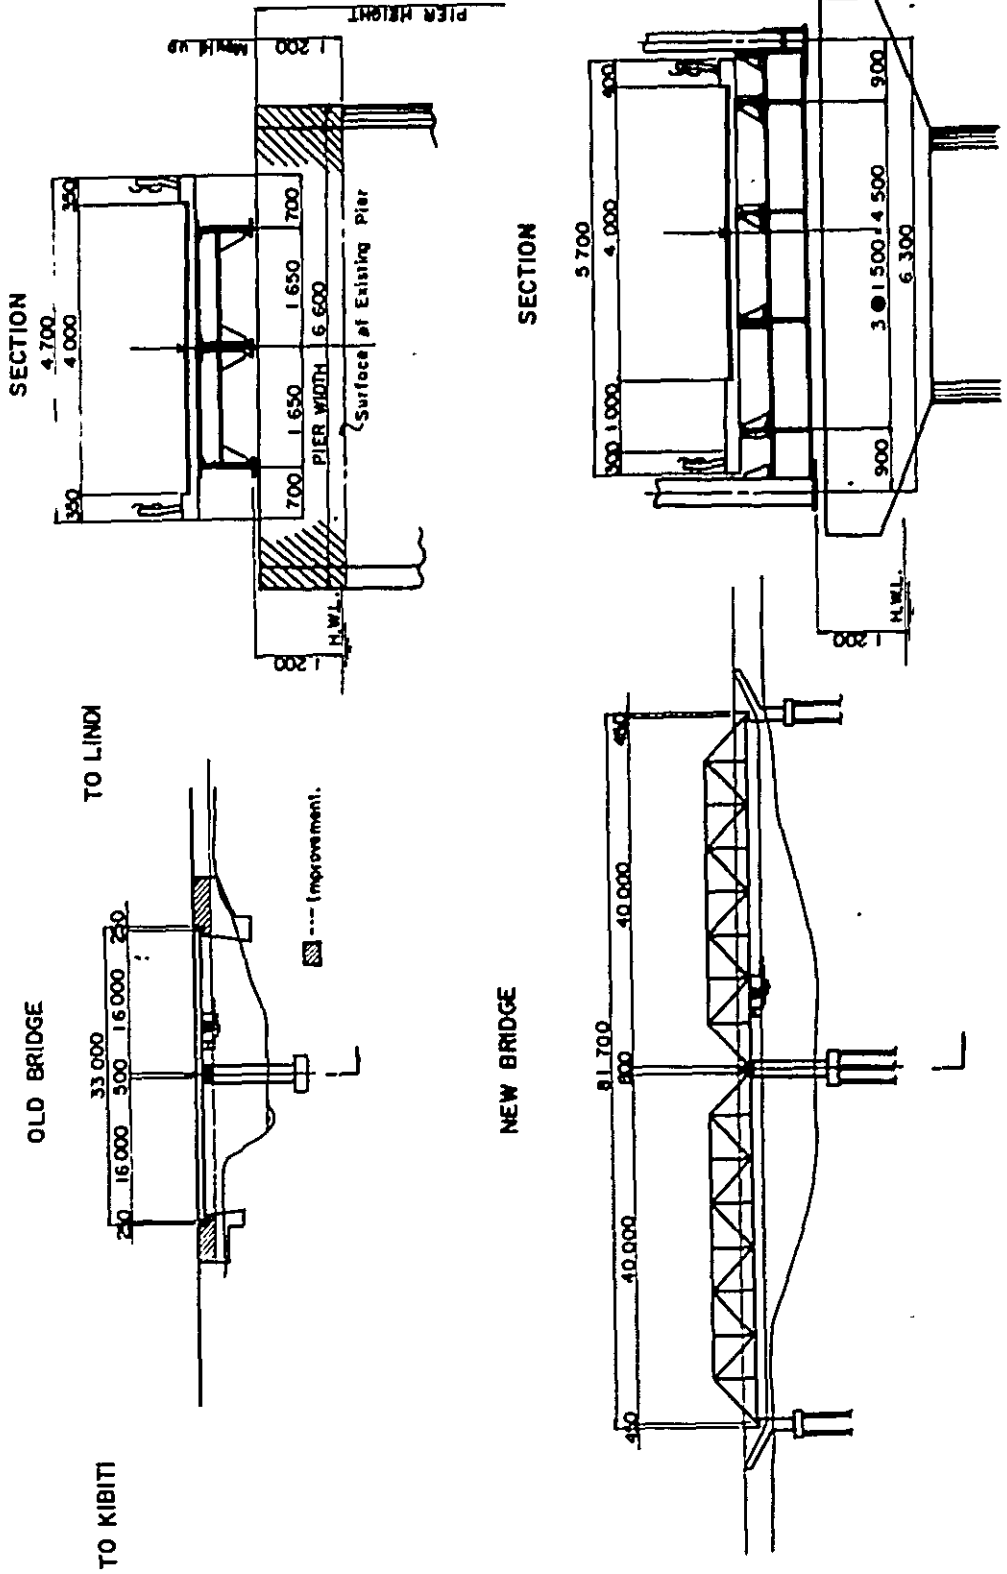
SOUTHERN COASTAL LINK ROAD PROJECT IMPROVED DESIGN OF THE EXISTING MATANDU RIVER BRIDGE
